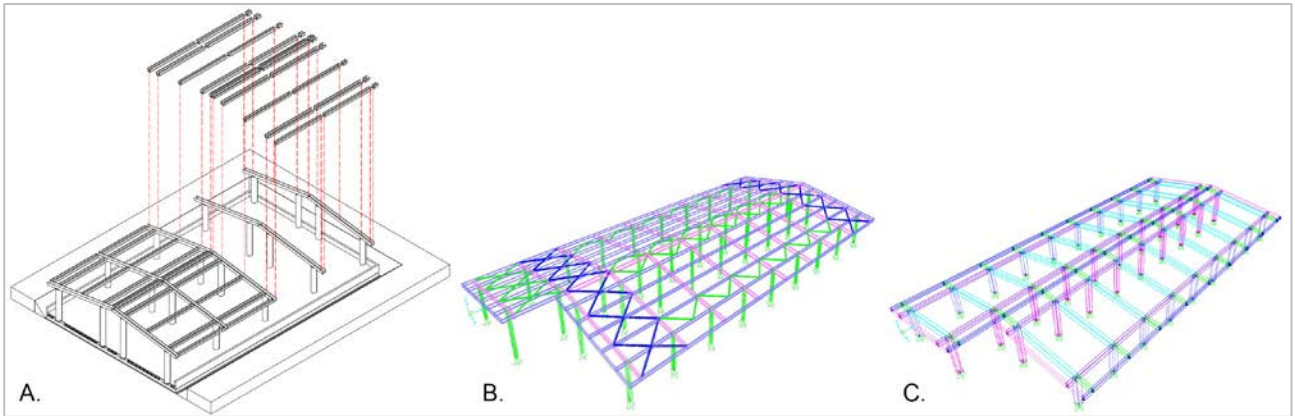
Single-storey building: A. NPS® system; B. conventional steel structure; C. conventional reinforced concrete structure.
